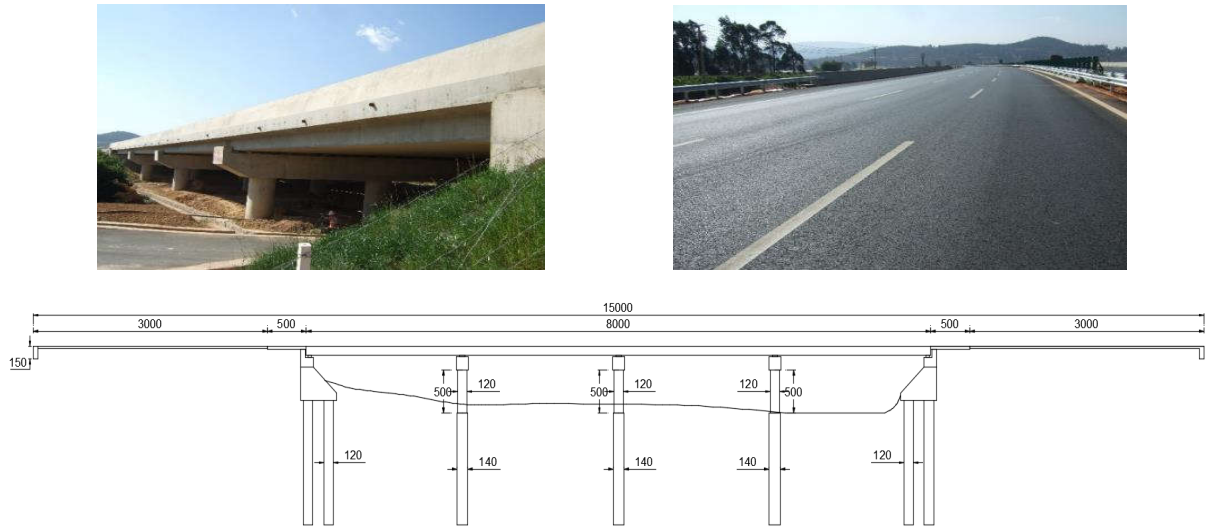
As-built fully jointless semi-integral bridge in Kunming: (a) elevation, (b) plan, (c) size (cm)
